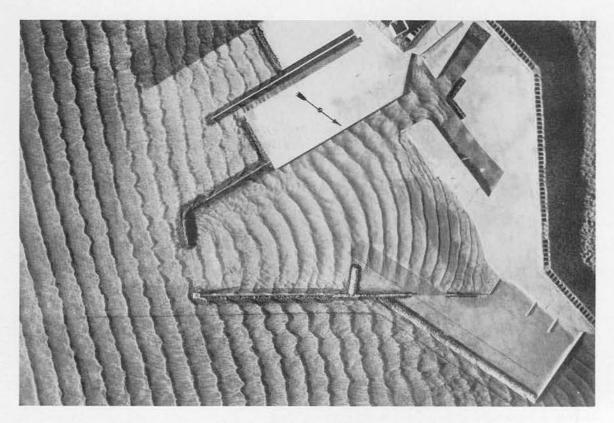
Plan E with 6.0-sec waves 14.5-ft high from the southeast
